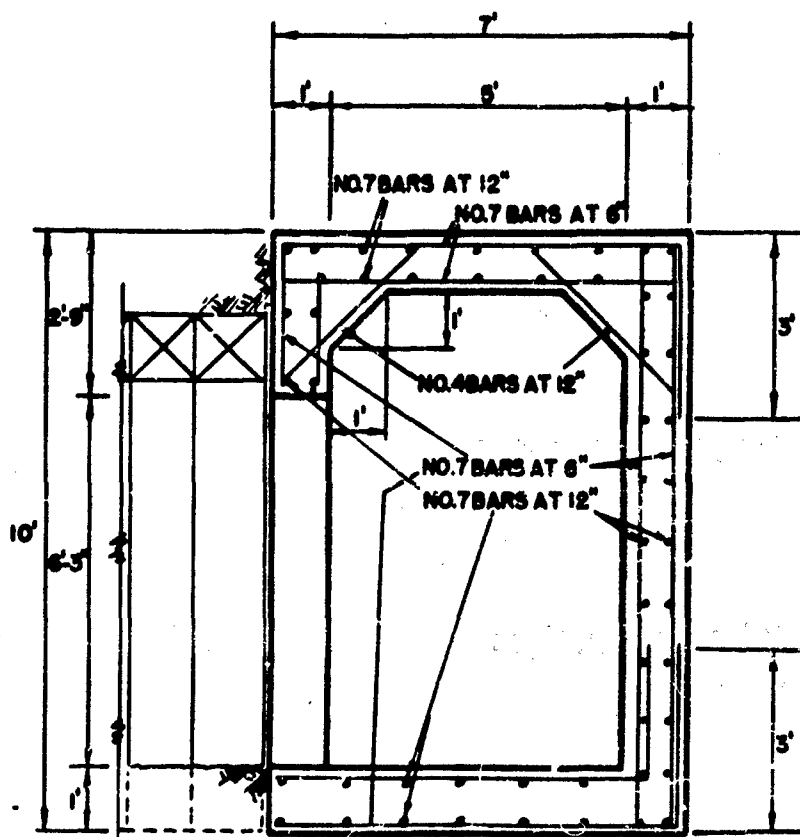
Exterior walk-through door foundation: Section B-B.
